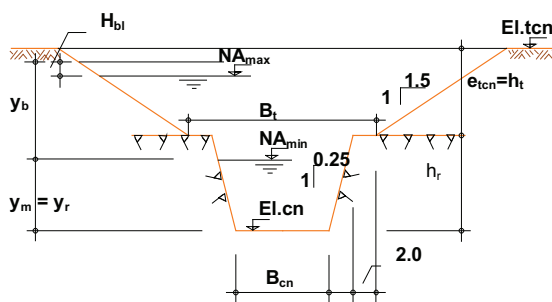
Typical cross-section of a headrace canal through rock (case 2).
